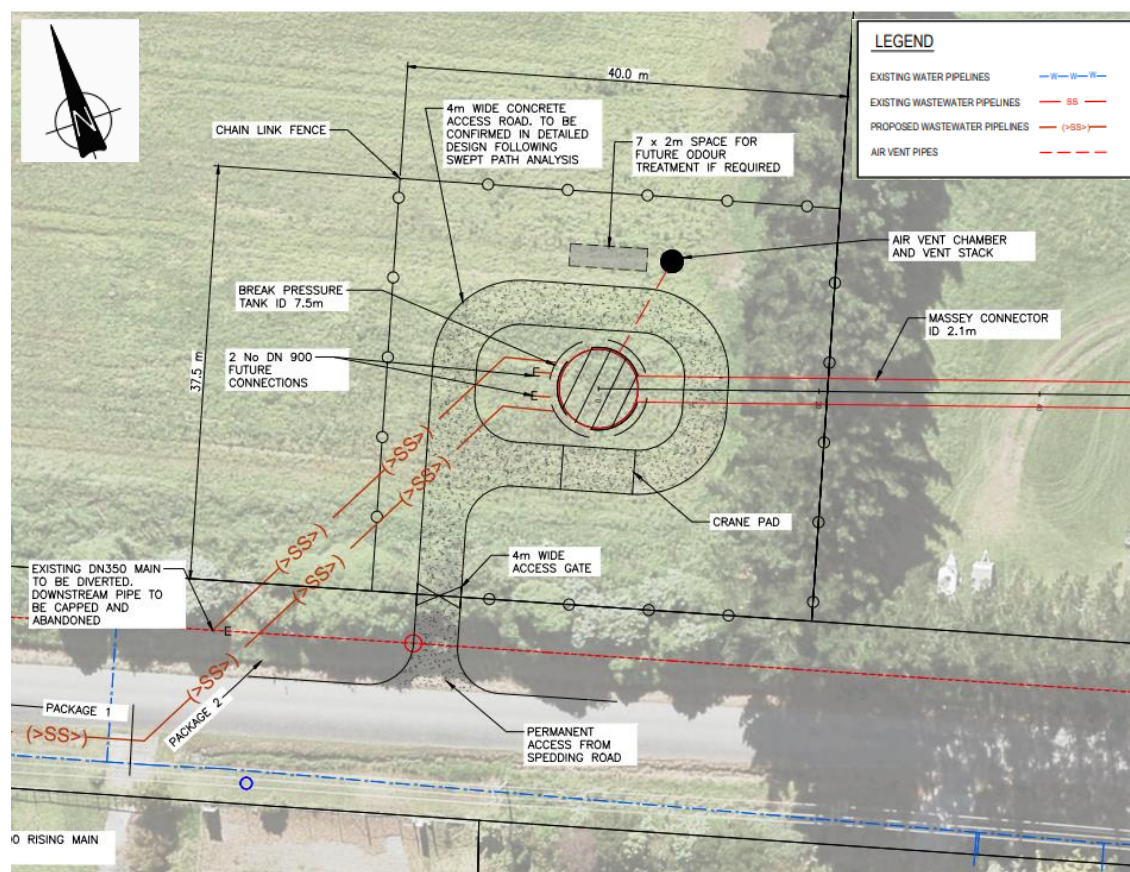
Break Pressure Tank Site Layout 8 Spedding Road
